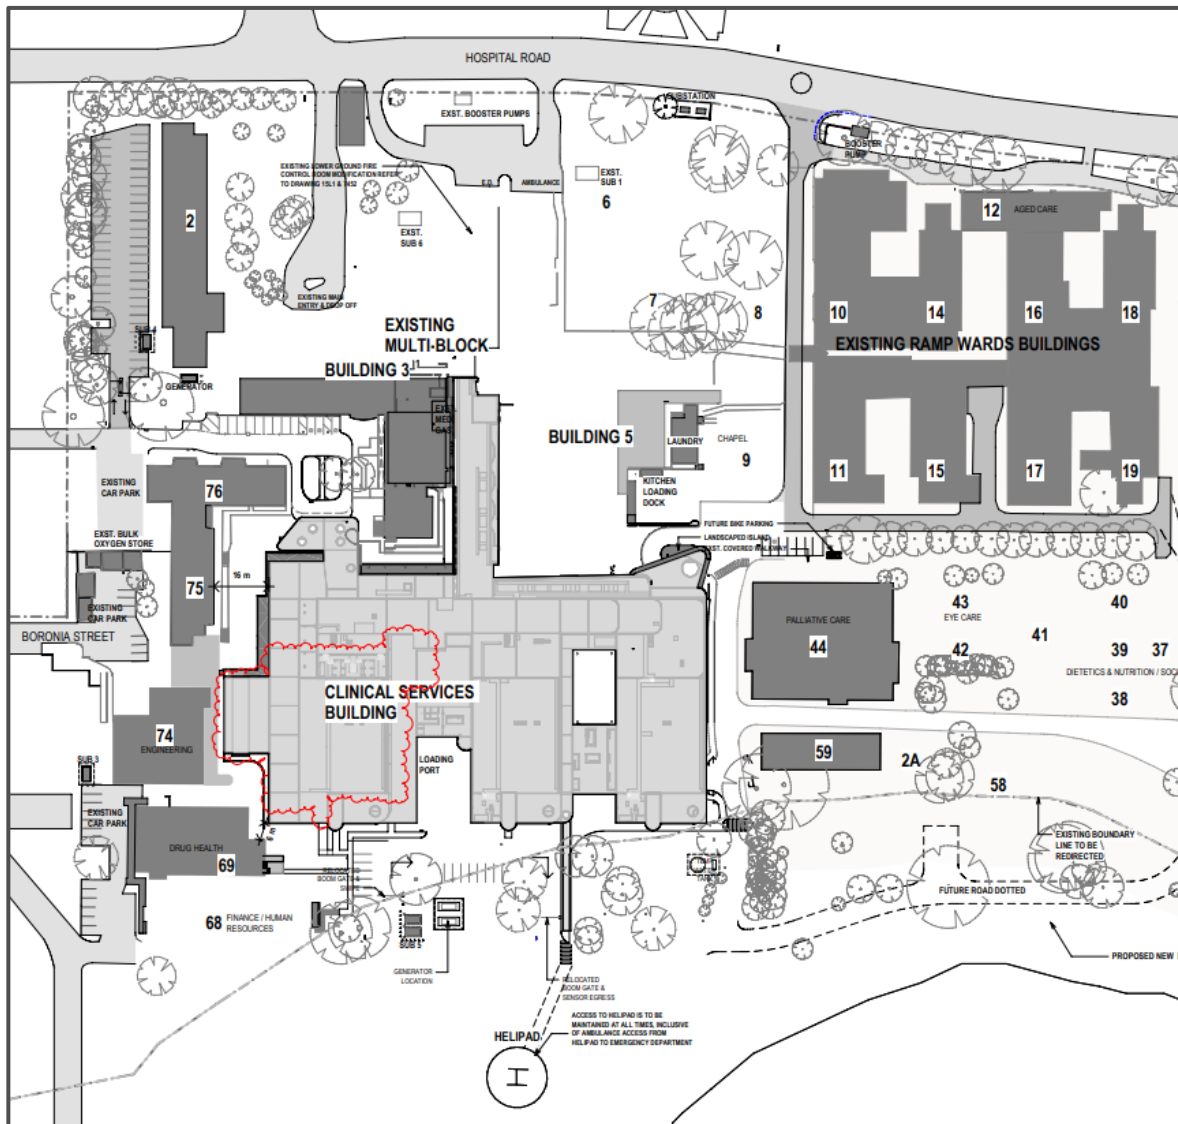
| Hospital campus layout and modification area shown in red cloud (Source: Applicant’s architectural plans)
